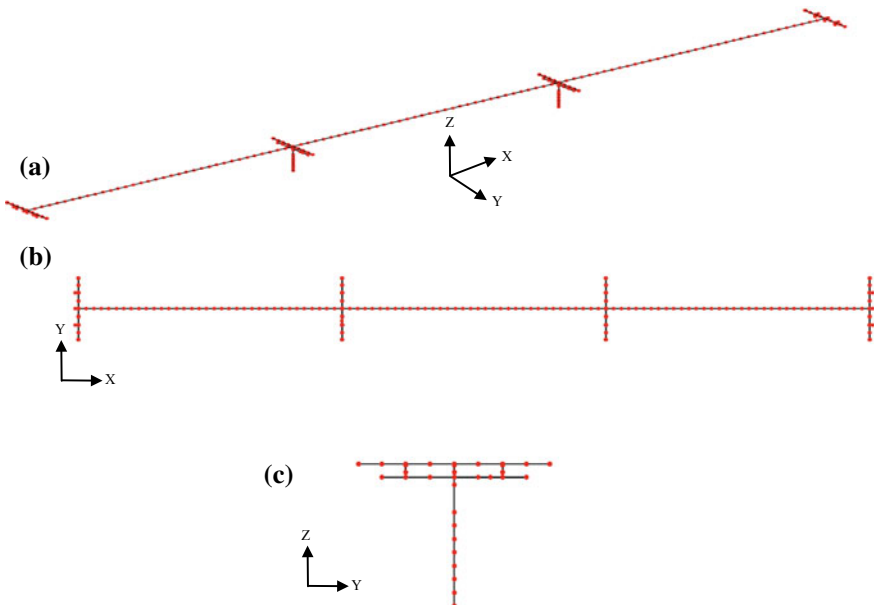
Finite element model of the bridge: a isometric view, b plan view, c side view
